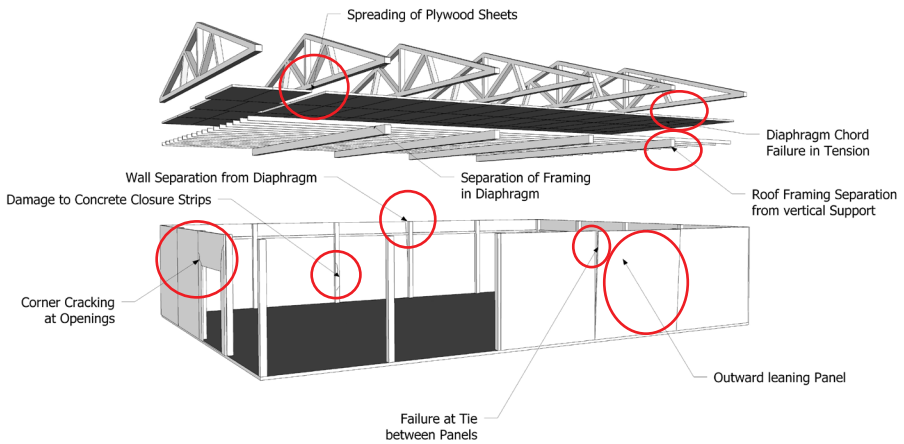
Typical damage areas in reinforced tilt-up slab structures
